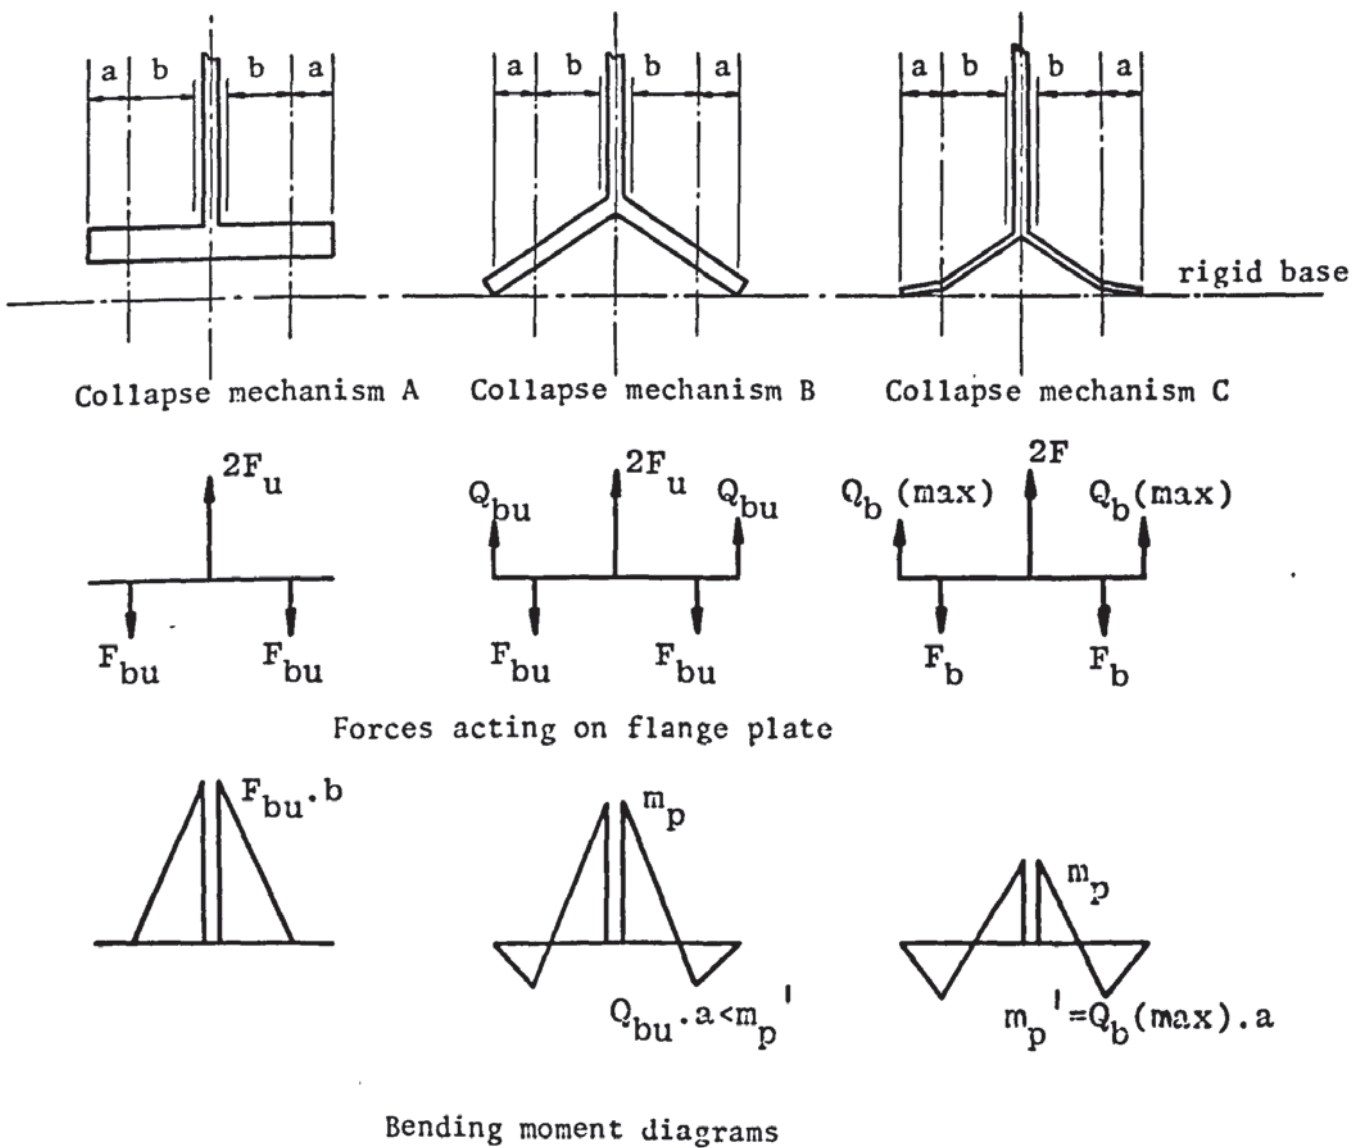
COLLAPSE MECHANISMS OF TEE SECTION FLANGE
